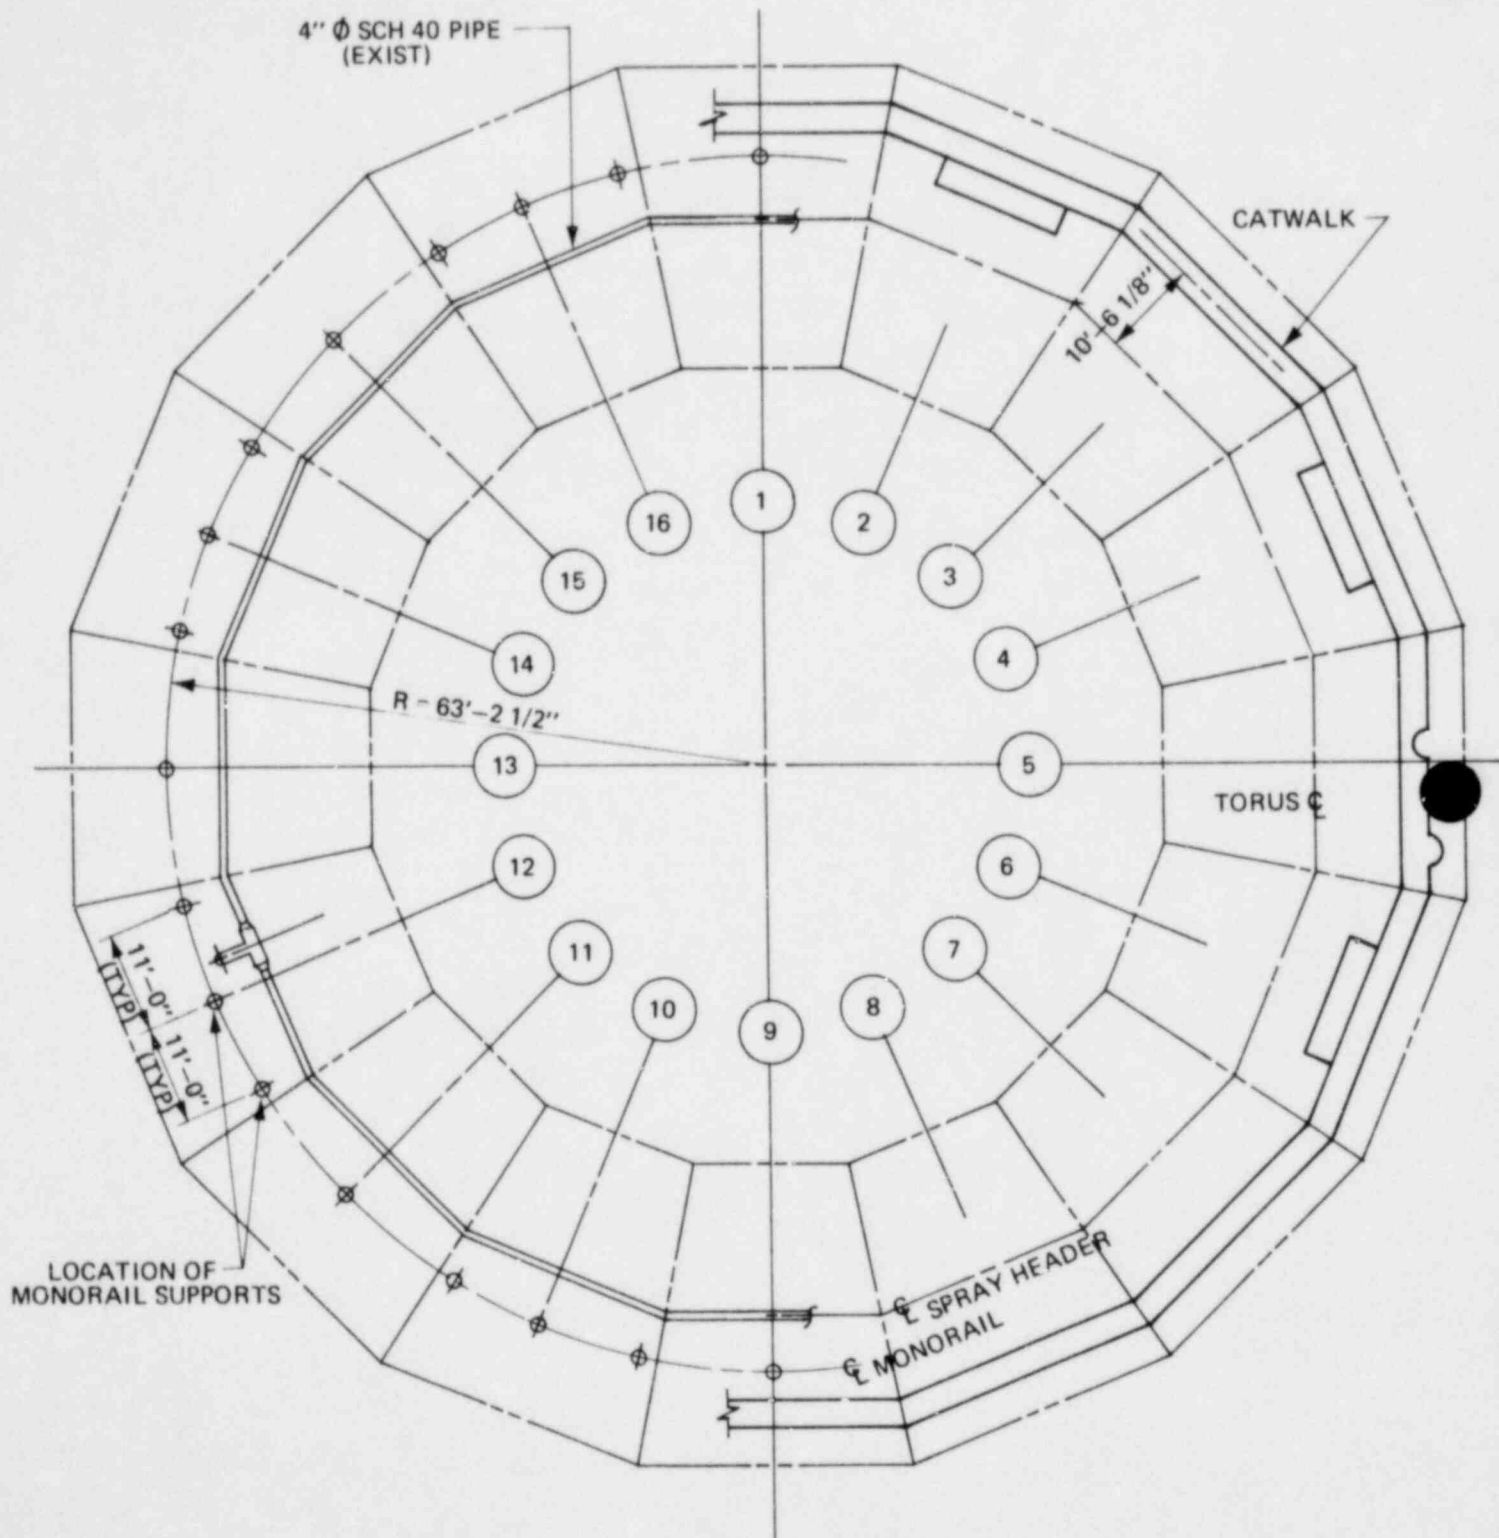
PLAN OF CATWALK, MONORAIL AND SPRAY HEADER
